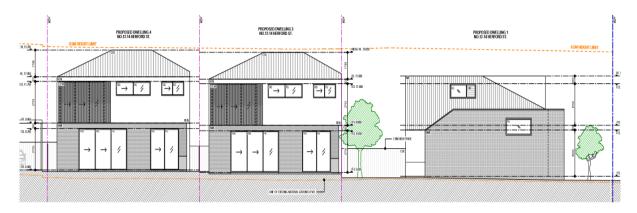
Northern elevation of proposal looking from the sports grounds of Banksmeadow Public School.
